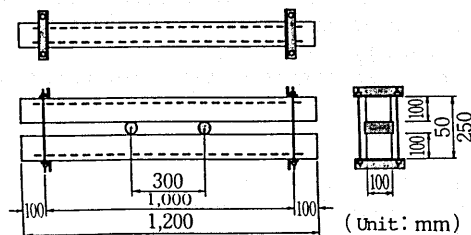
Exposed Reinforced Concrete Beam Specimens under Three-Point Flexural Loading.
